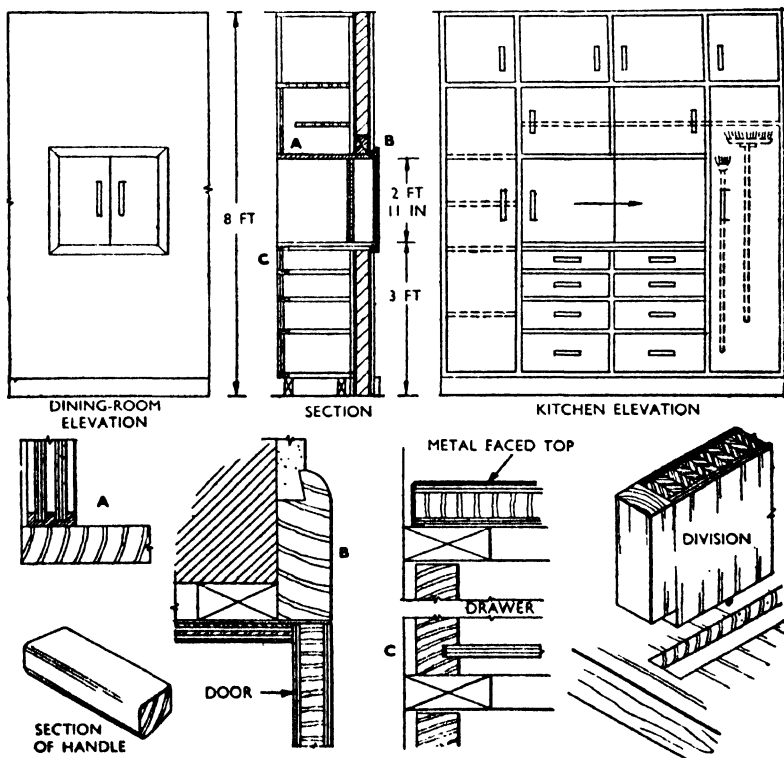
Typical kitchen fitment with serving hatch leading to dining room.
